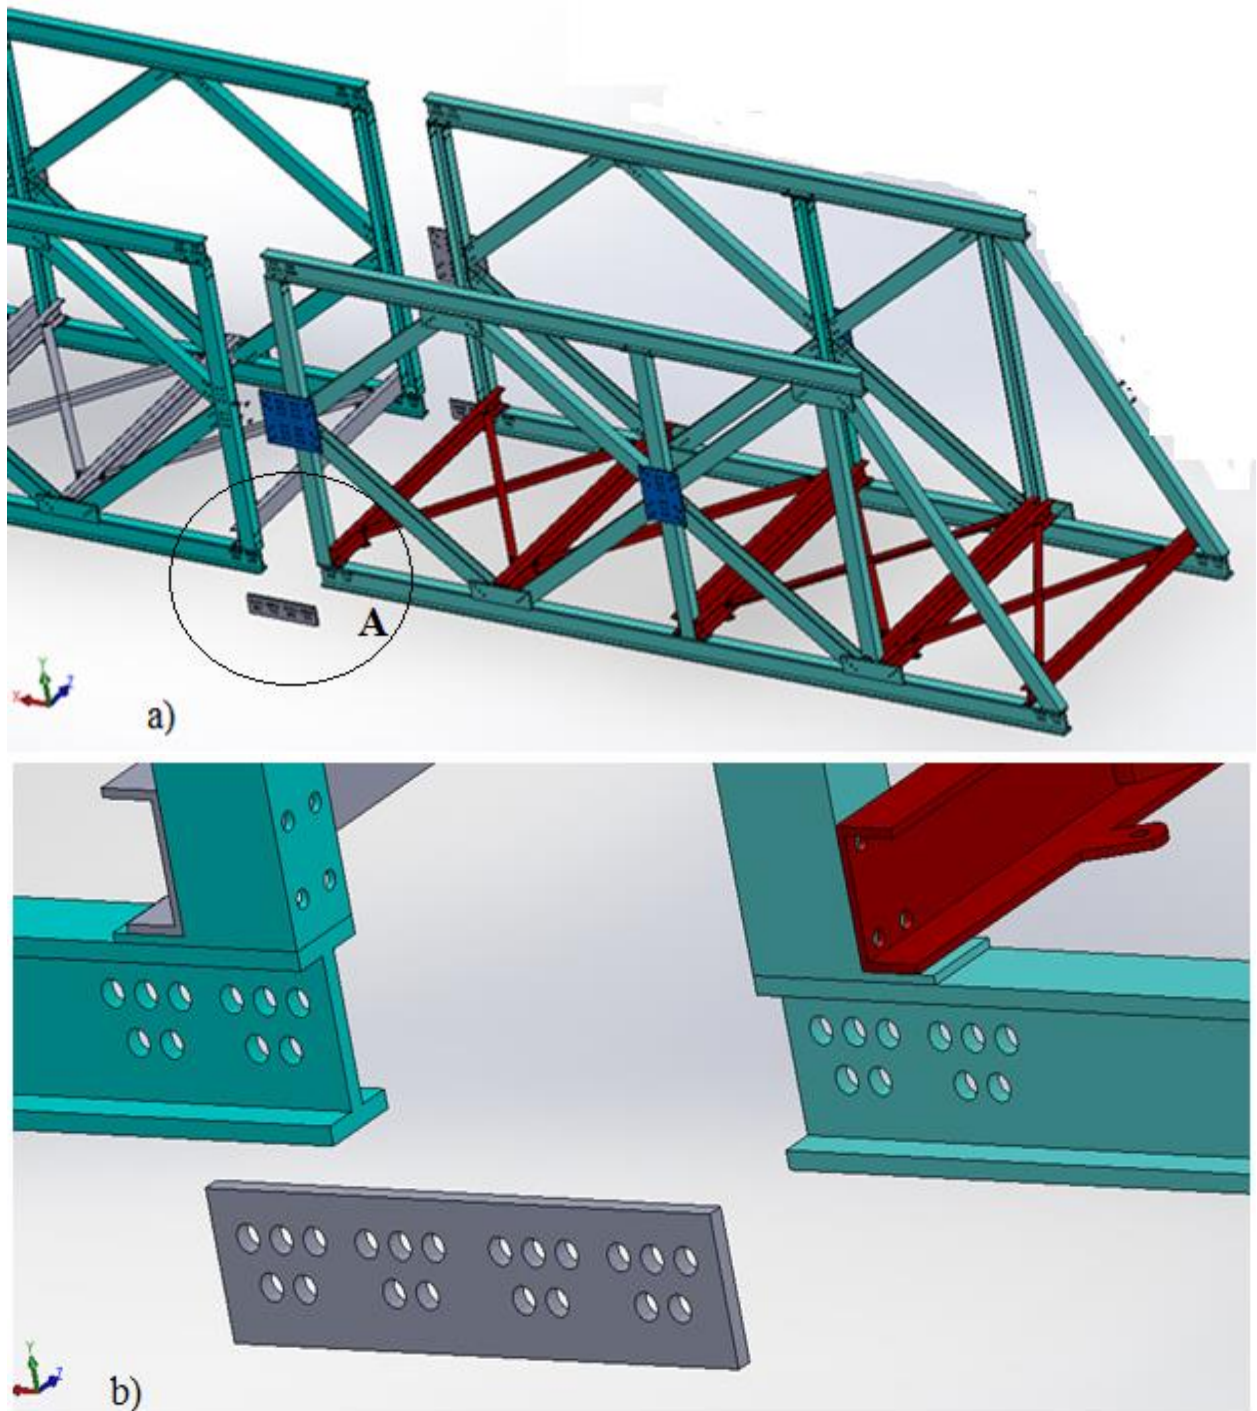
a) Assembly of truss modules using Joining Bracket) detail view of section (A)
